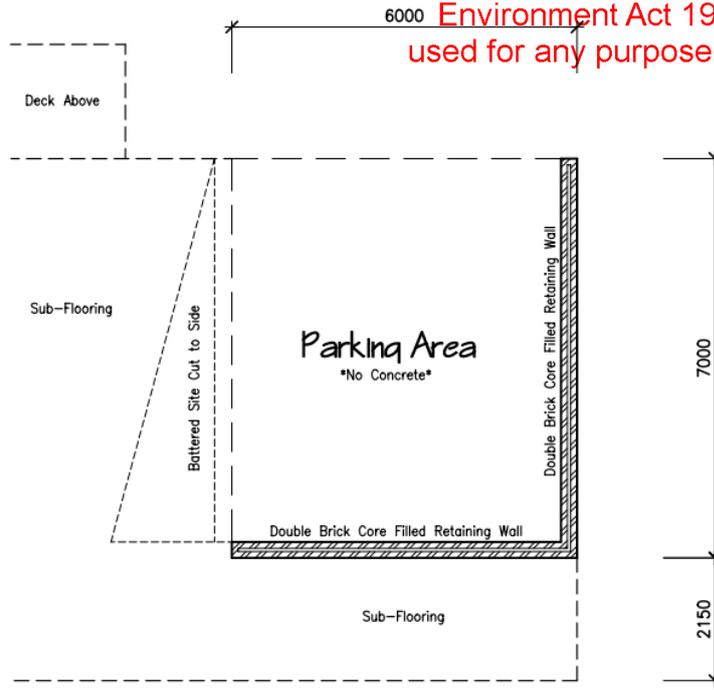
Parking Area to be located under elevated eastern portion of the dwelling
